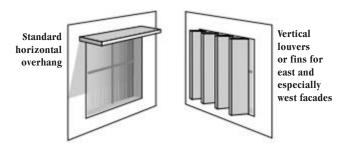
Window shading (source: : Shading Strategy, Section 5)
